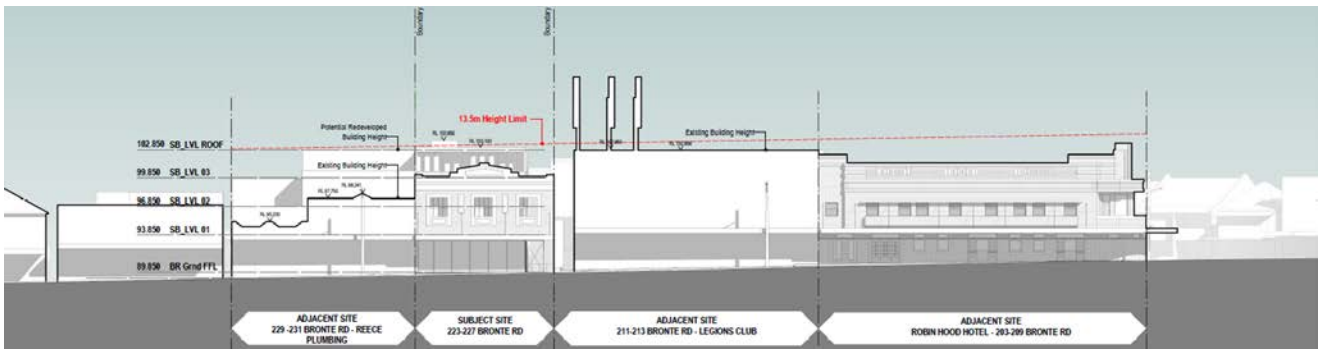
Concept design – elevation, Bronte Road (east) (source: H&E Architects)
